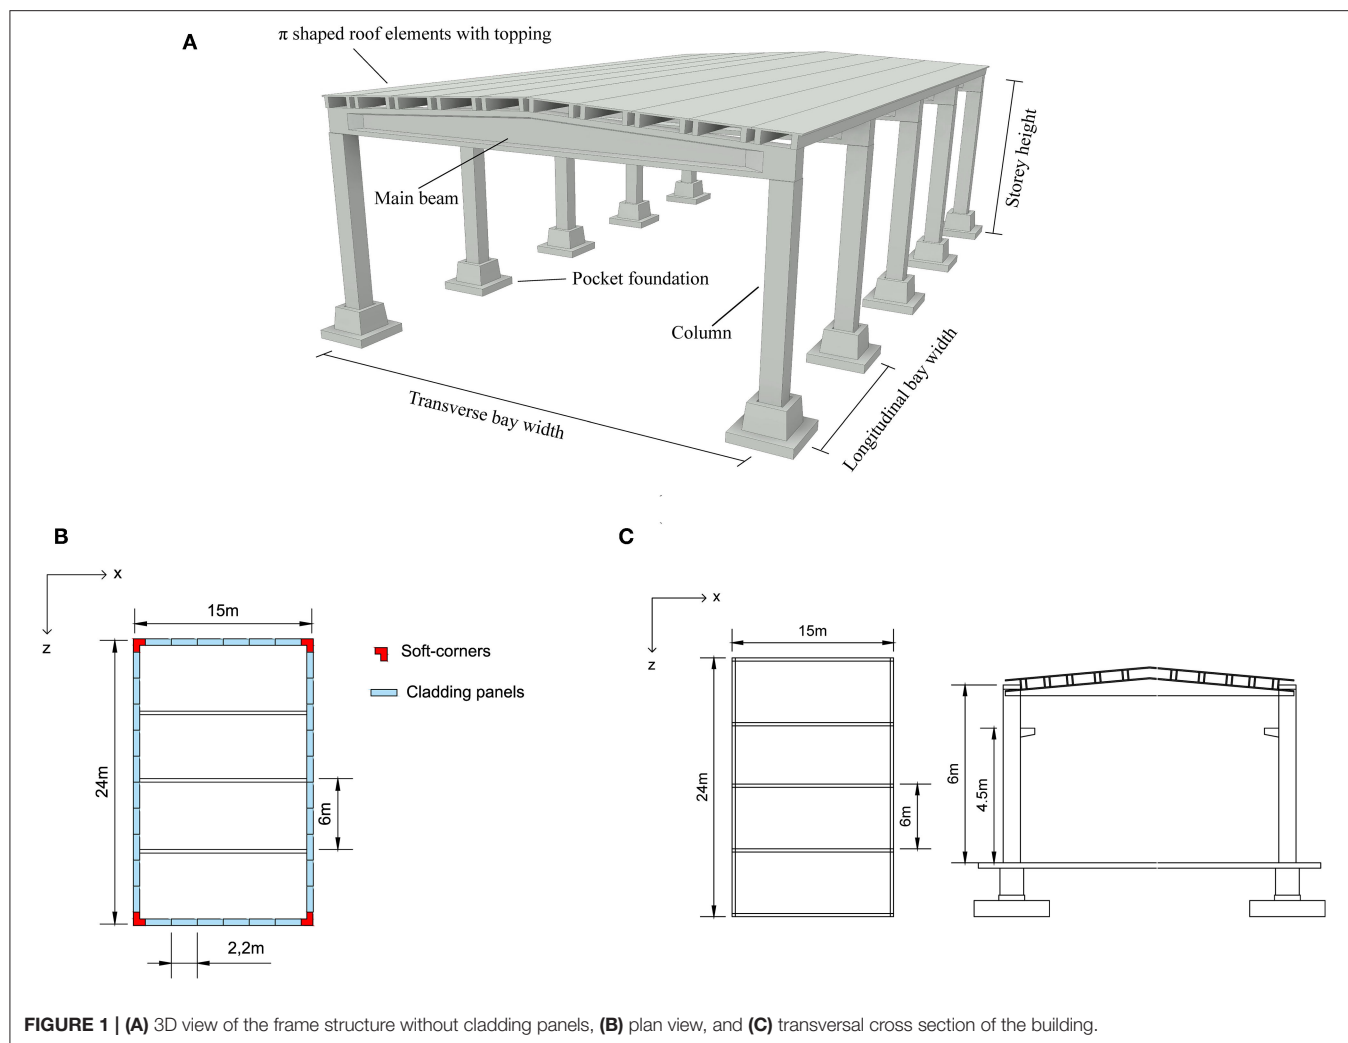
| (A) 3D view of the frame structure without cladding panels, (B) plan view, and (C) transversal cross section of the building.
